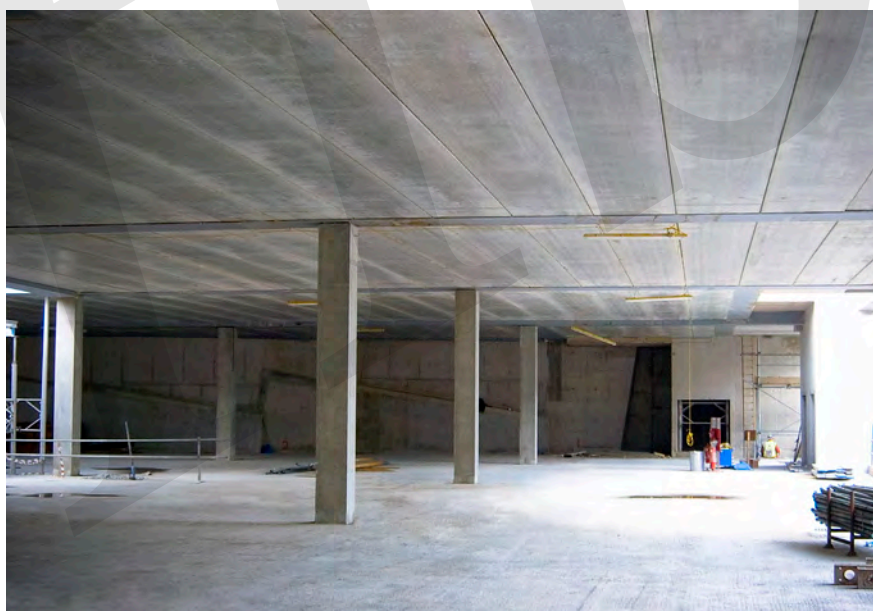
Flat slab solution using Slim Floor DELTABEAM® and hollowcore slabs, courtesy of ©Peikko Group Corporation.
